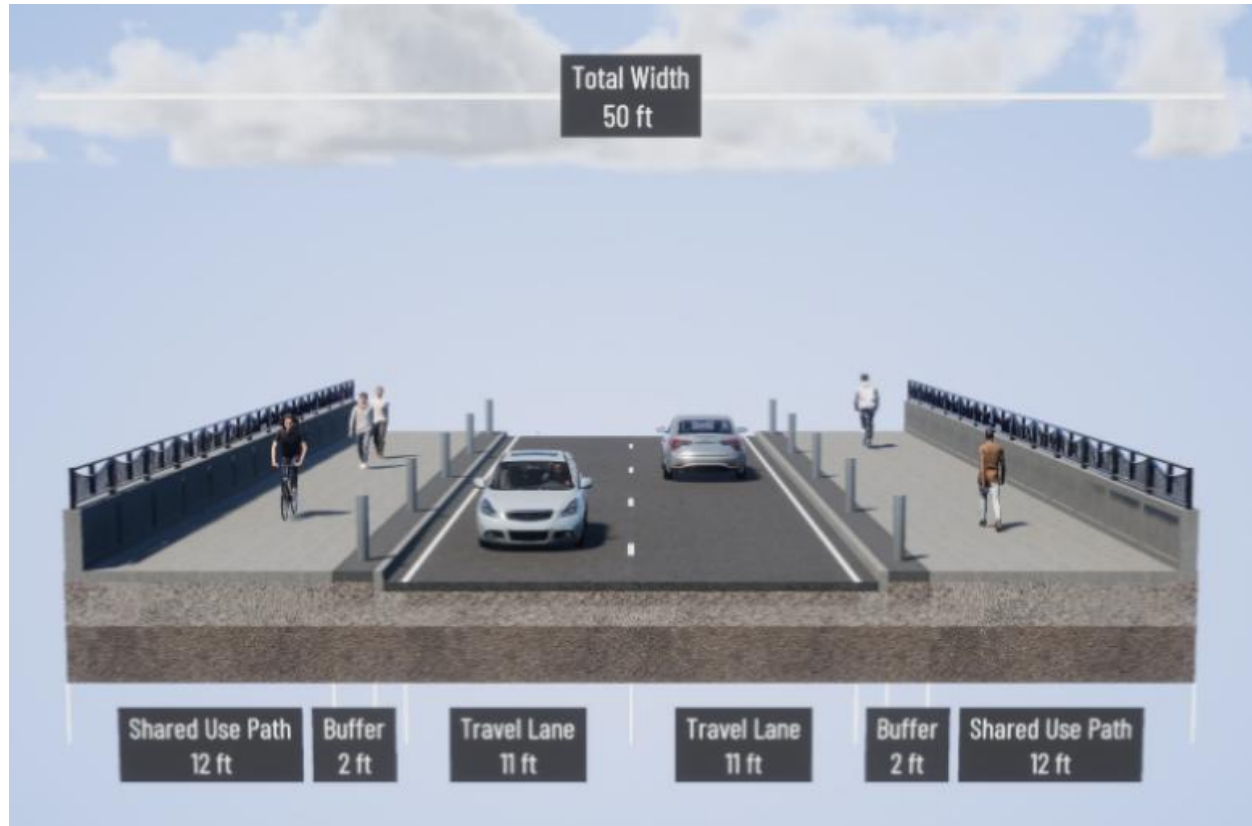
Canal Vehicular Bridge – 50' ROW Option 1 (Shared or Local Street)
